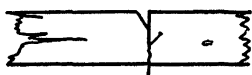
Showing batter strip with notch for holding line in place and nail to fasten it to
